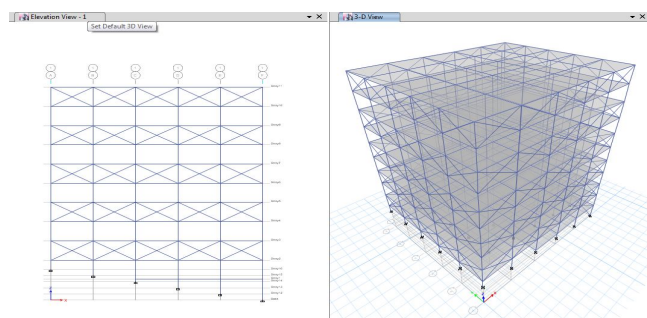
Elevation and 3D View of braced Building Model at 20 degree angle of sloping
